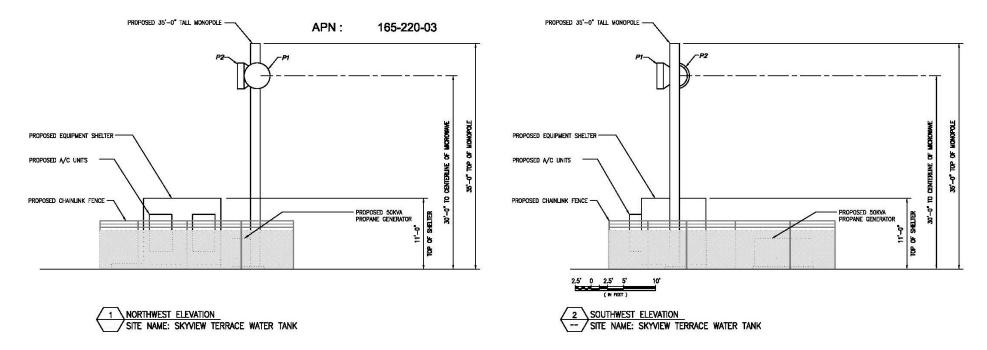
Site 22 - Skyview Terrace Water Tank - Two Proposed Elevations
